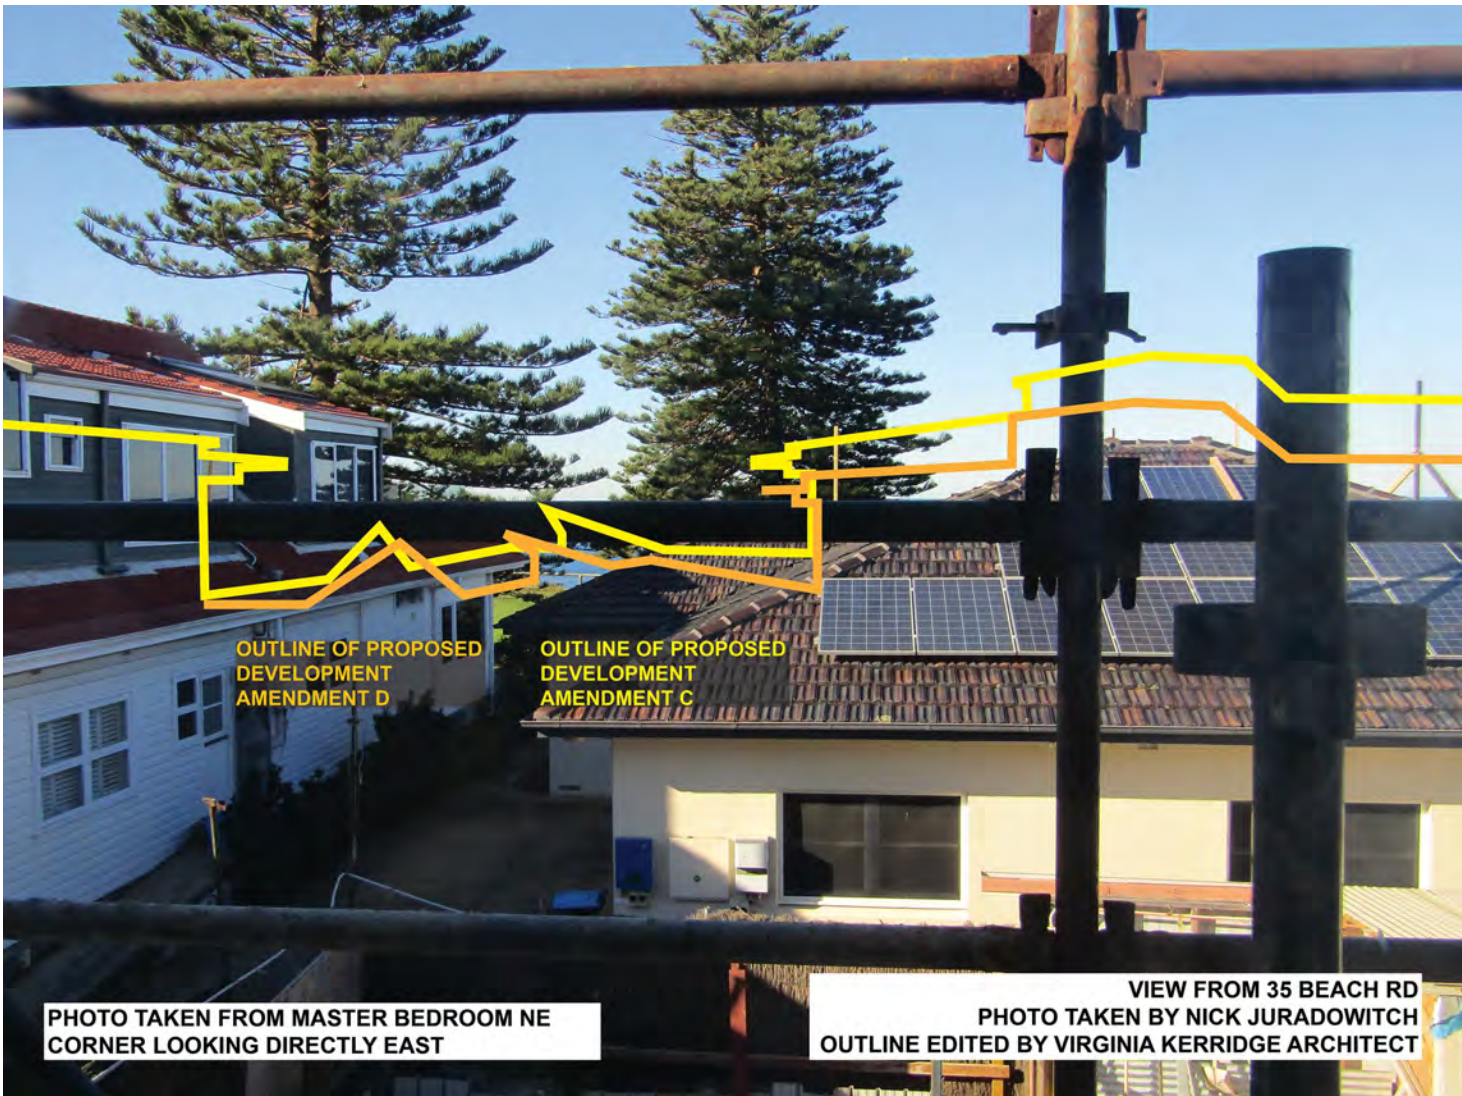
PHOTO EDITED BY VIRGINIA KERRIDGE ARCHITECT.
